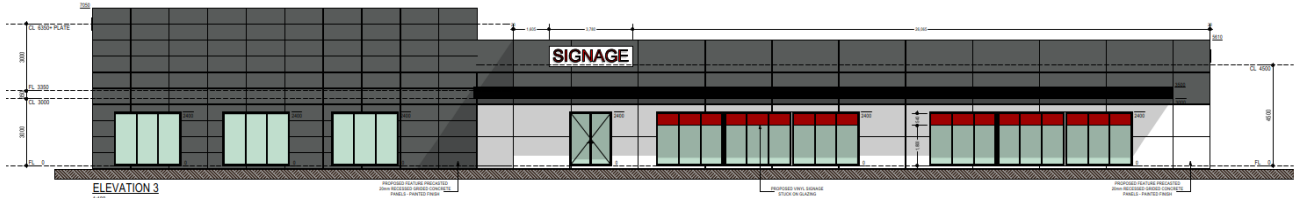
Gym Elevation 3 (Laxxon Construction Design)
